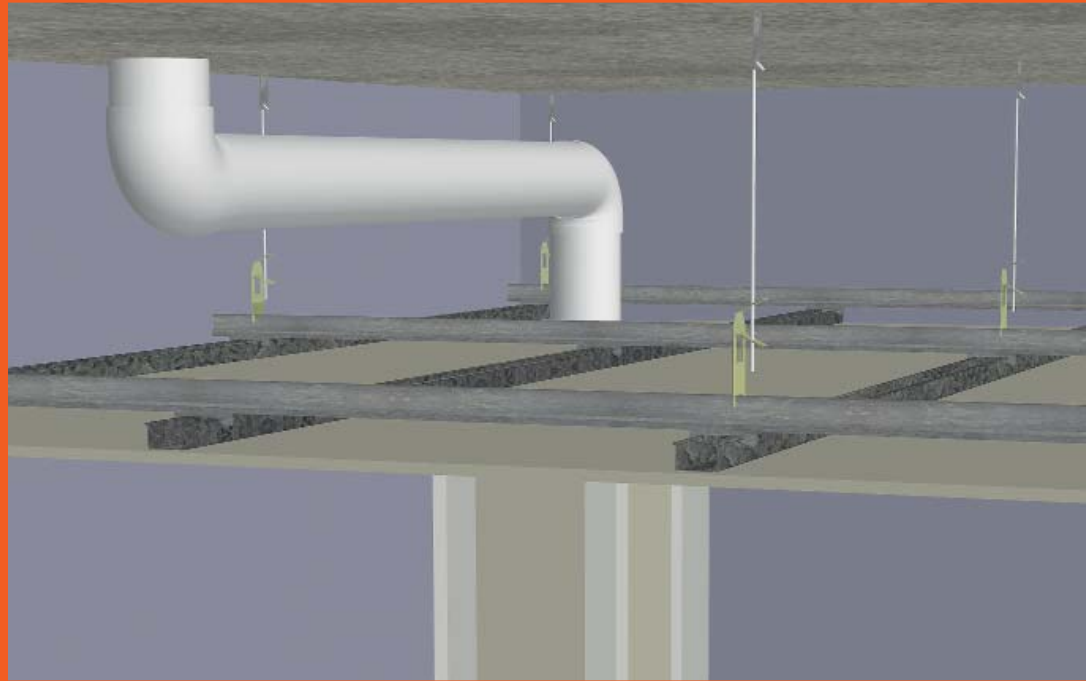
Shaft Wall Ceiling Detail System KSHWC4 only
